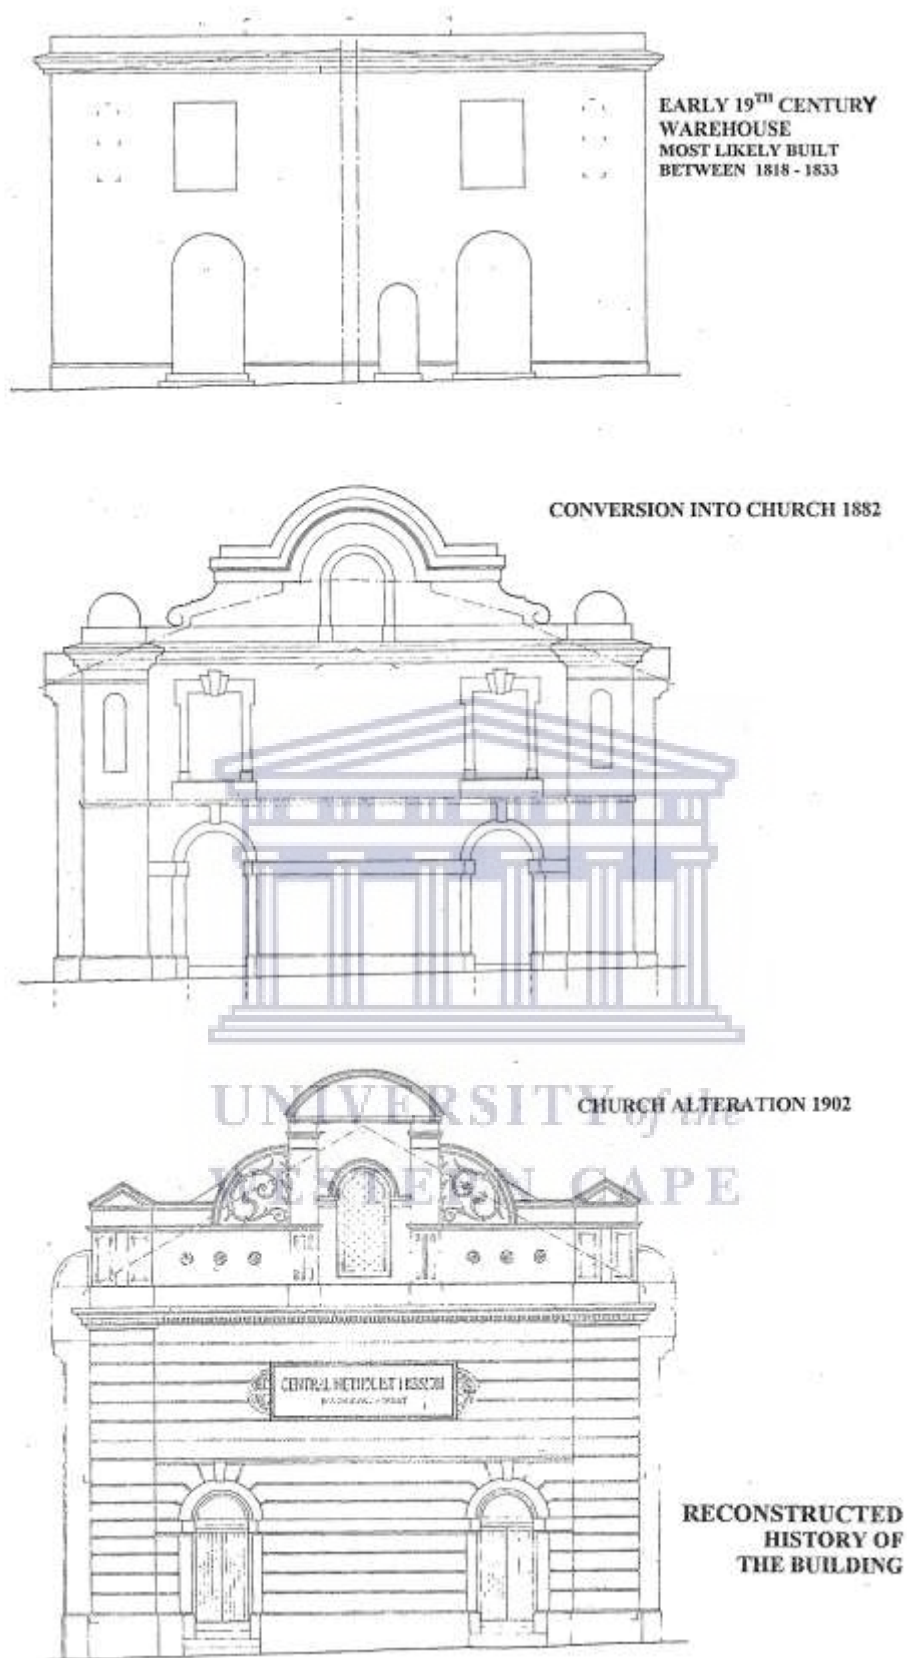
Architectural drawing of the reconstructed history of the Buitenkant Street Methodist building, 1998.
